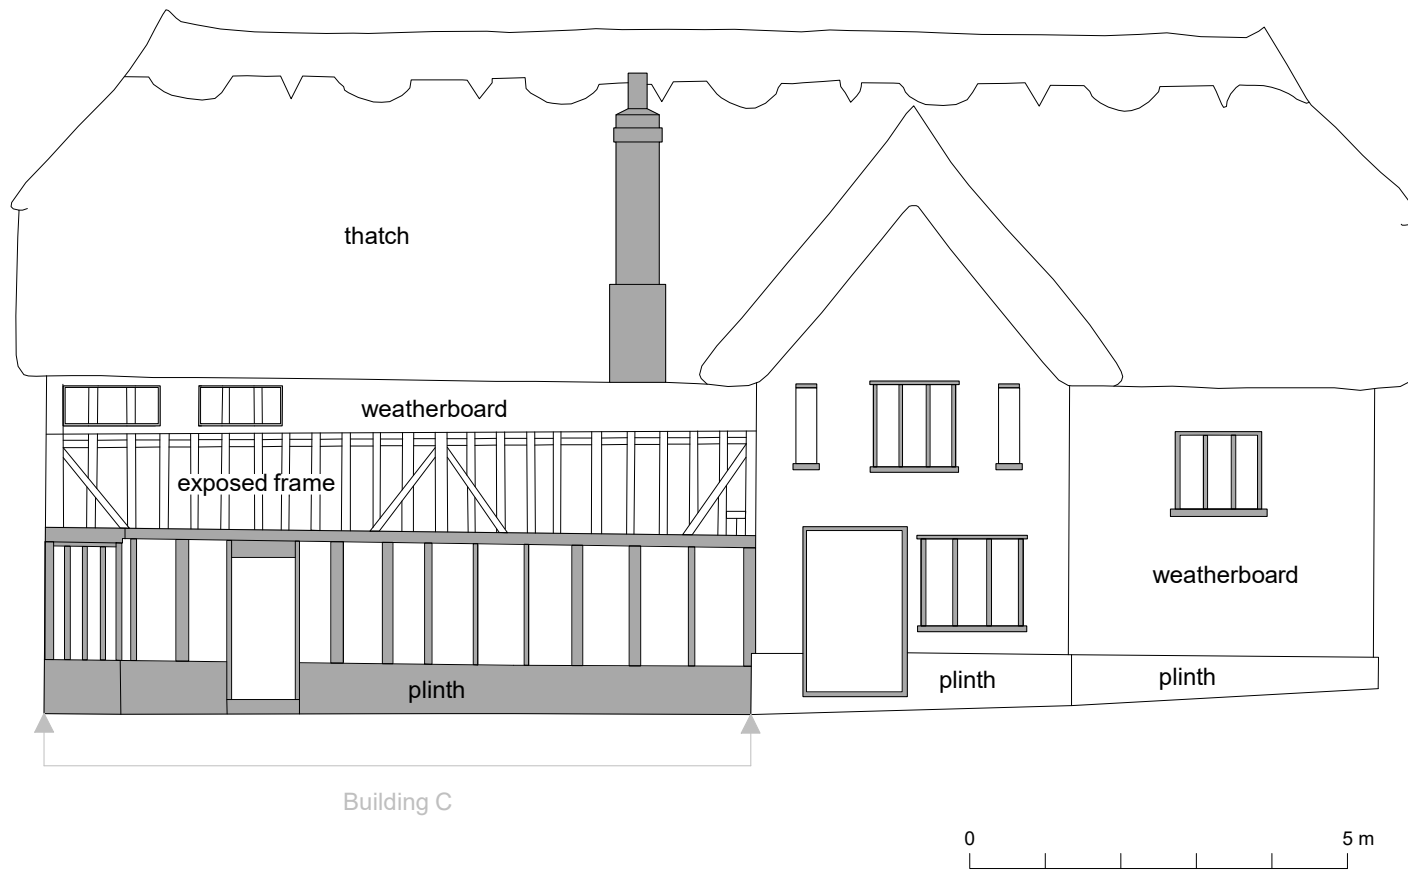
Southern elevation of barn and Building C. Modern additions shown in grey.
